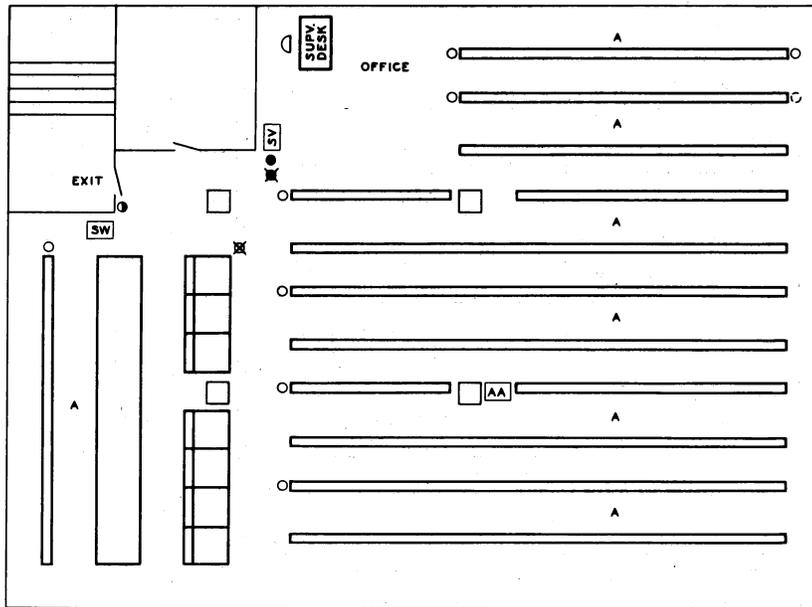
Typical Audible and Visual Alarm Equipment in Office With Main Cross-Aisle—Terminal or Switchroom
